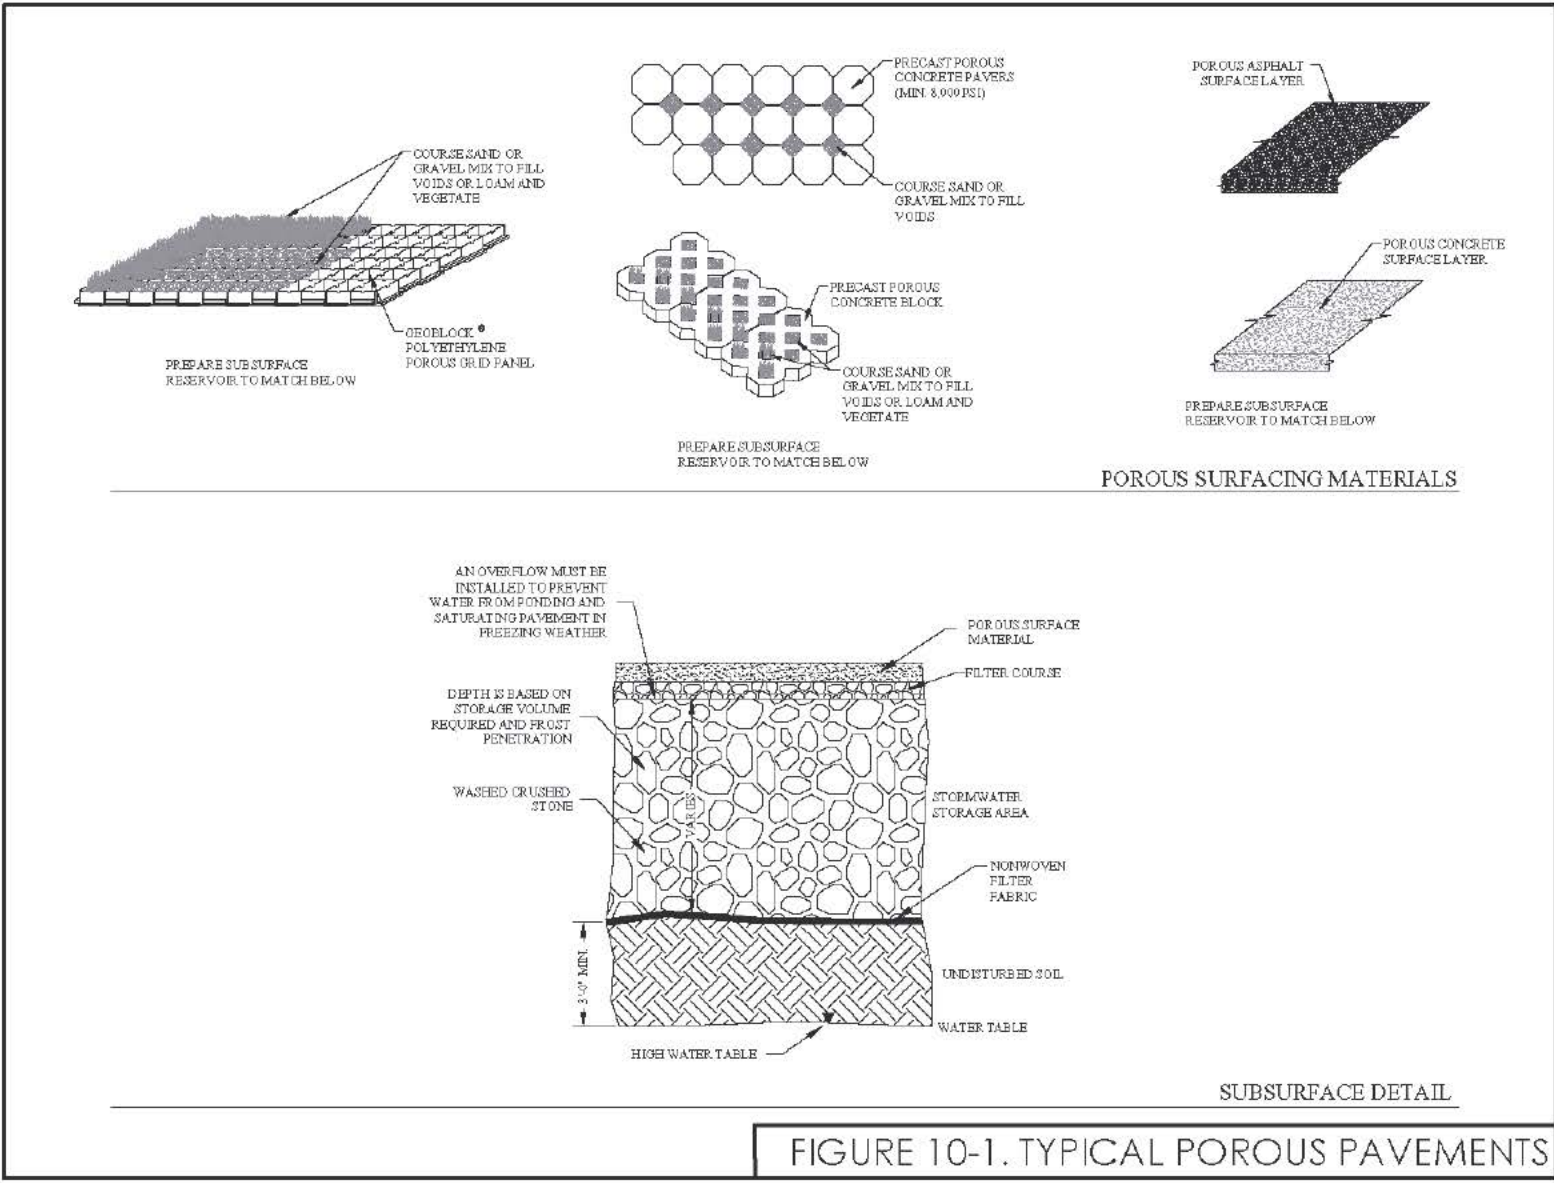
TYPICAL POROUS PAVEMENTS
